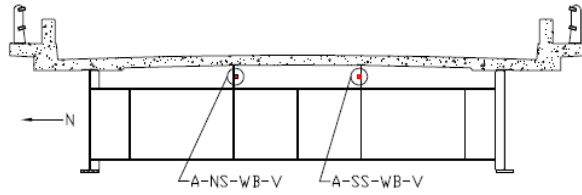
Cross Sections of US30 Bridge and Sensor Longitudinal Locations (Lu 2008)
